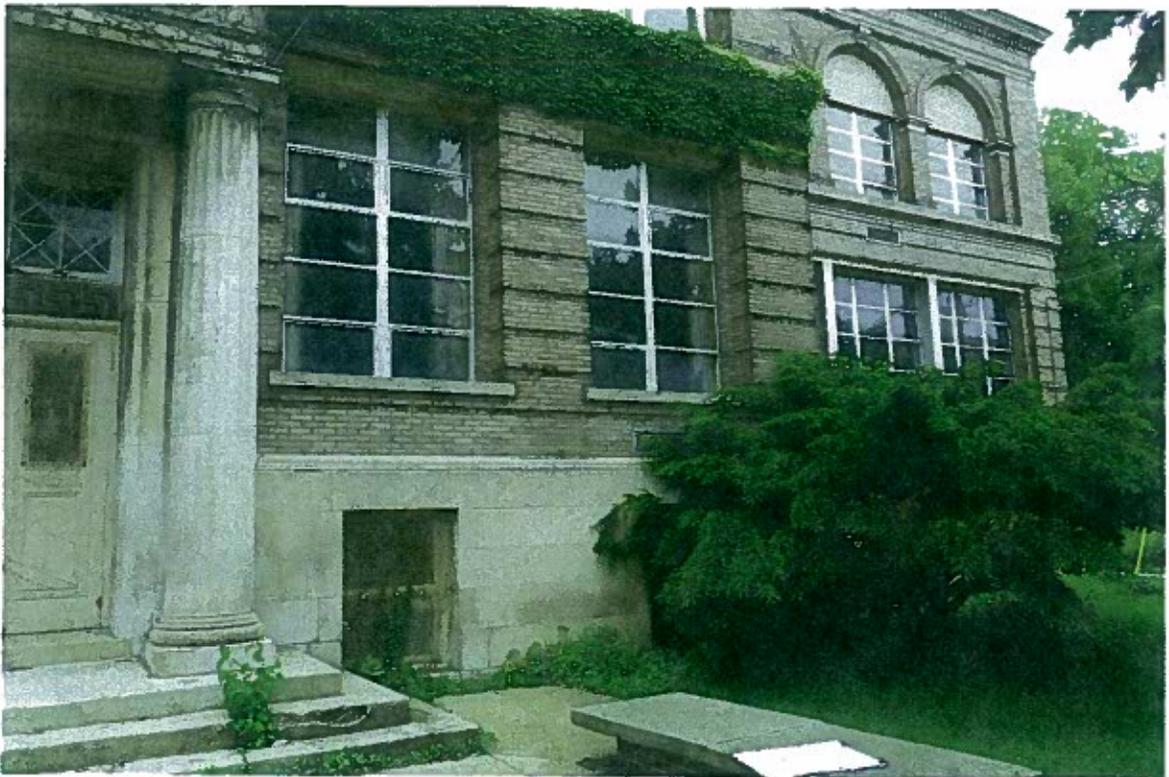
Wall area east of entry showing corrosion of lintels and spalling of concrete at steps.
